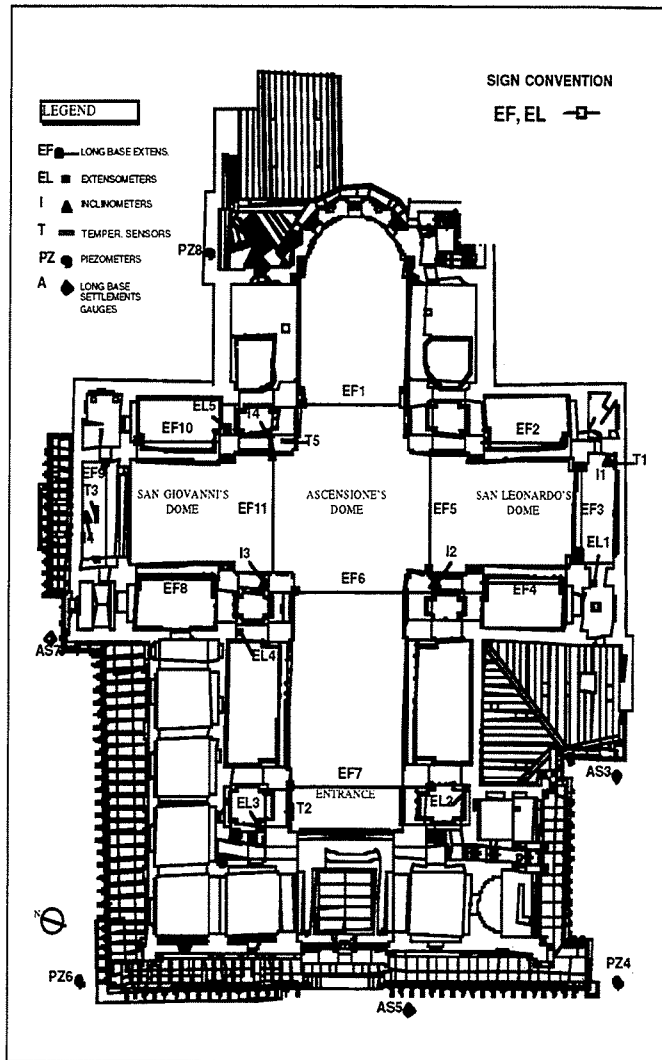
General lay-out of the structural monitoring system's instruments.
